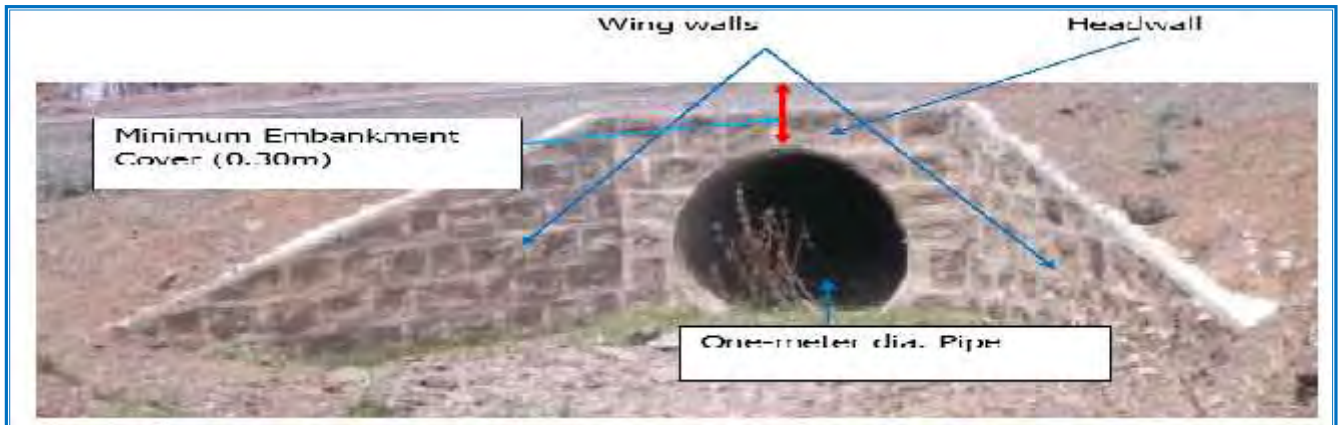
Proposed Pipe Culvert at Station 15+500
